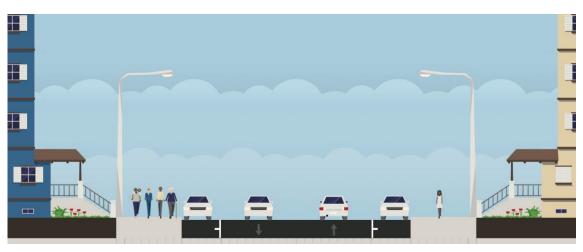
Existing Union St. Cross-section (Streetmix 2023)
